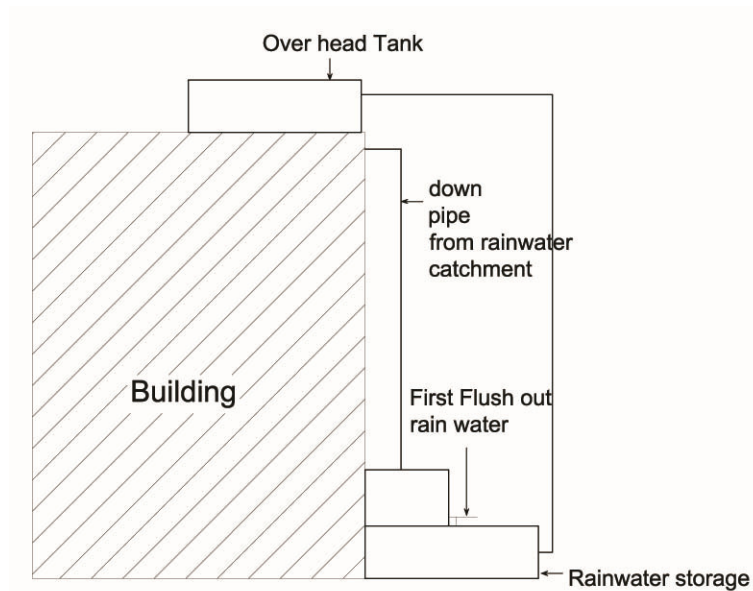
Section of a building showing rainwater harvesting system (schematic diagram)
